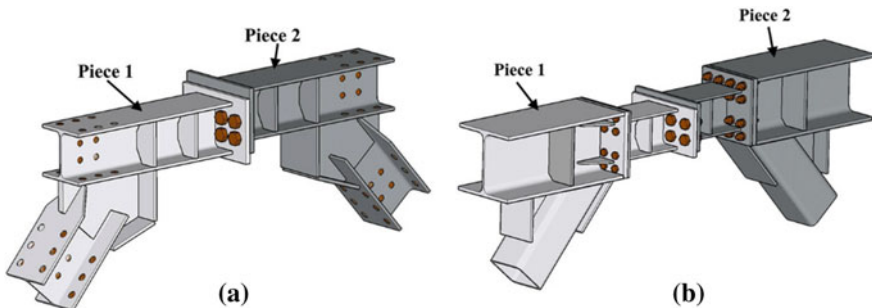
Proposed replaceable link details a spliced link with gusseted brace attachment, b bolted extended end-plated spliced link [33]
